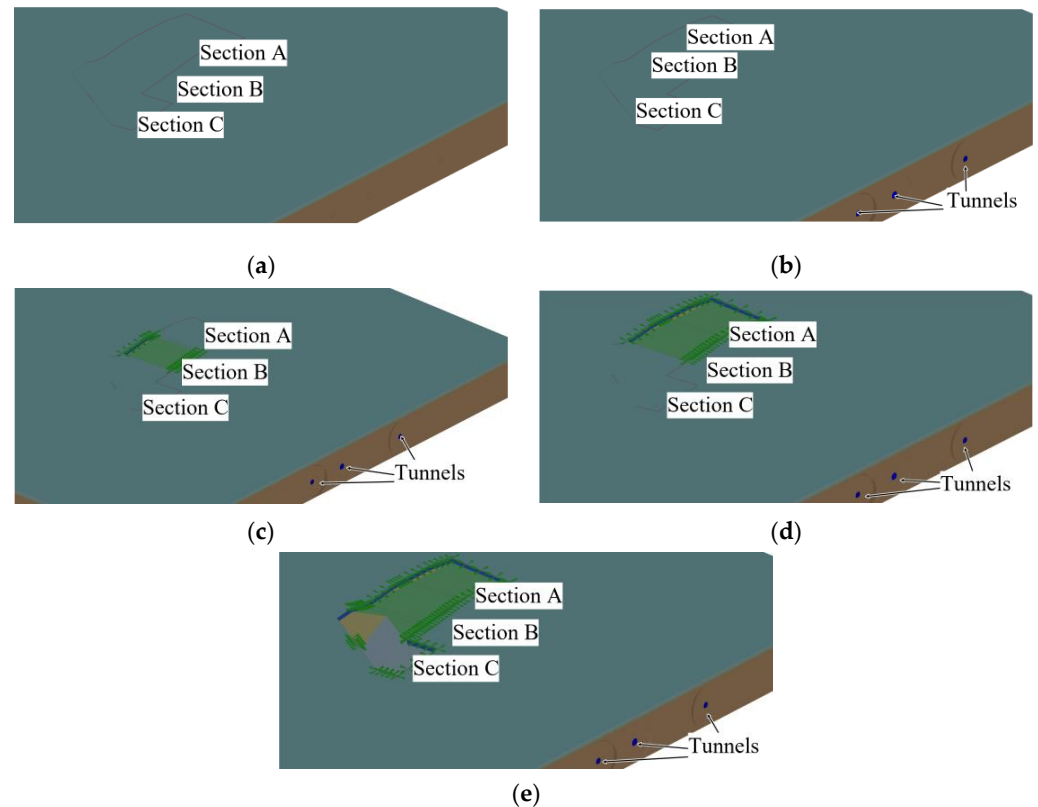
Simulation stages: (a) stage 1: earth stress equilibrium, (b) stage 2: tunnel excavation, (c) stage 3: section B excavation, (d) stage 4: section A excavation, (e) stage 5: section C excavation.
